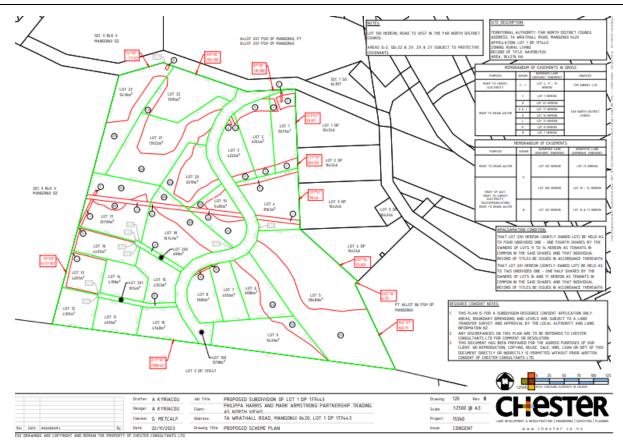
Proposed Scheme Plan. Source: Chester Consultants
